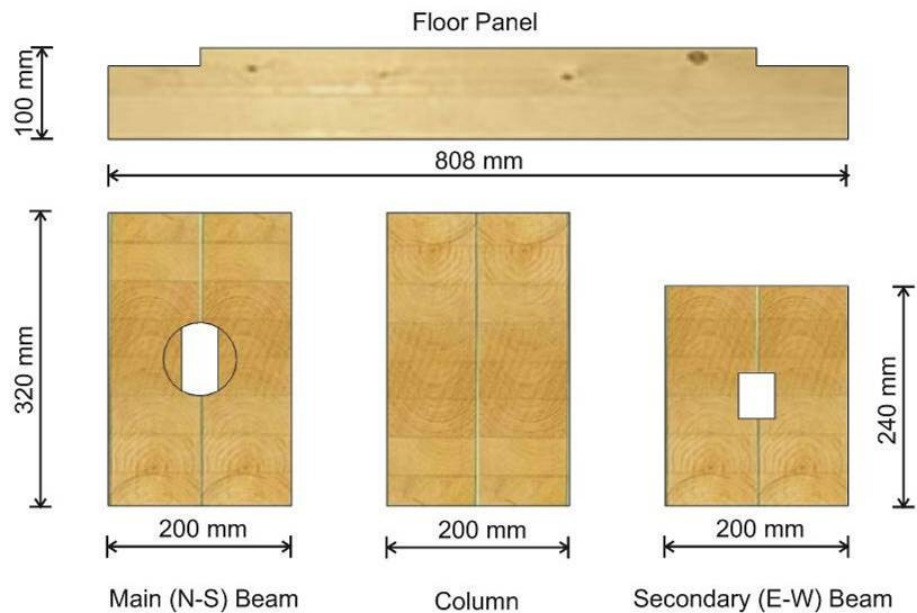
Design section sizes used in 2/3rd scale, 3-storey dynamic test frame
